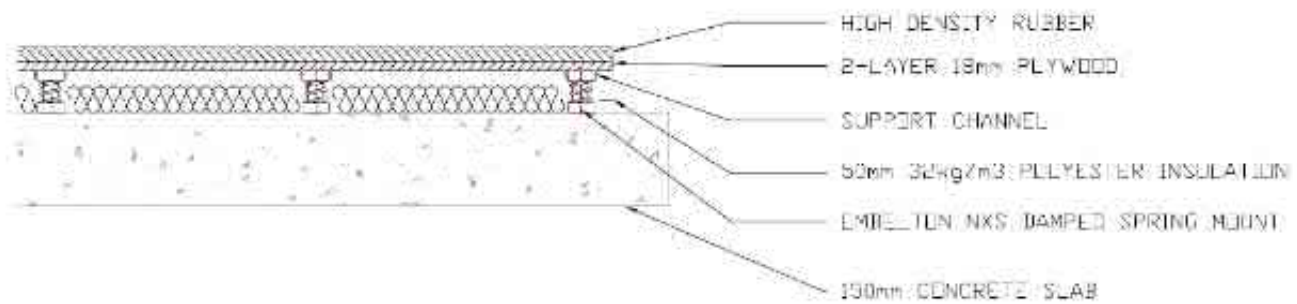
Damped springs with 2-layers, 18mm plywood and top surface rubber build-up
